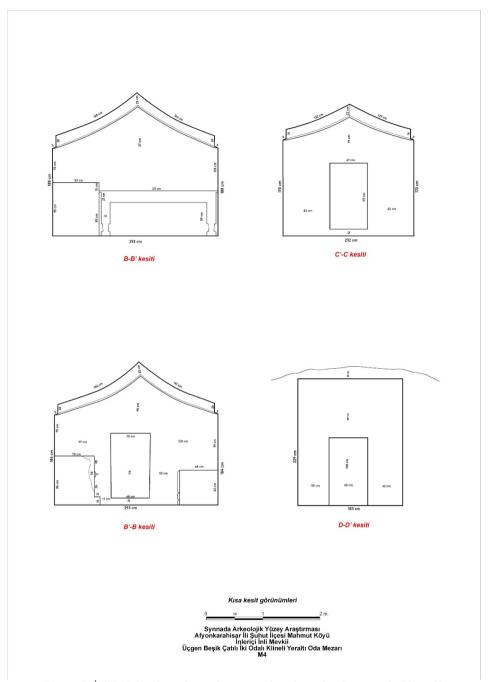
İnli M4 drawing, plan and cross-section view of rock-cut tomb (i.baytak)
